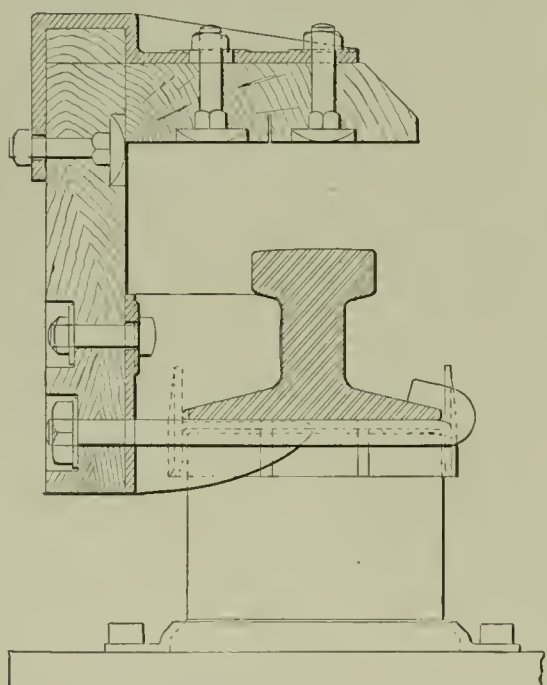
SECTION OF THIRD RAIL AND GUARD
